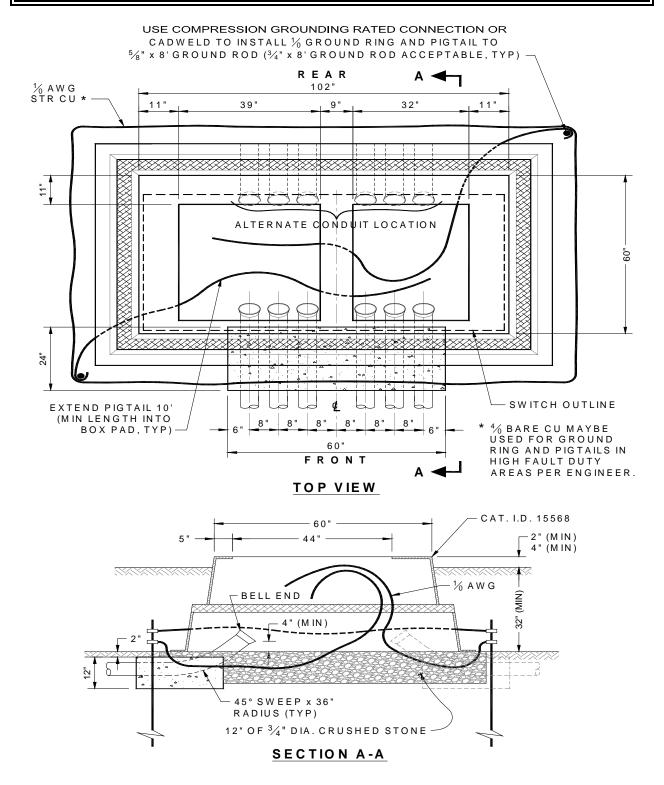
Typical Fiberglass box Pad Installation Details to support 15kV, G & W Model PVI-9, SF-6 Switch
